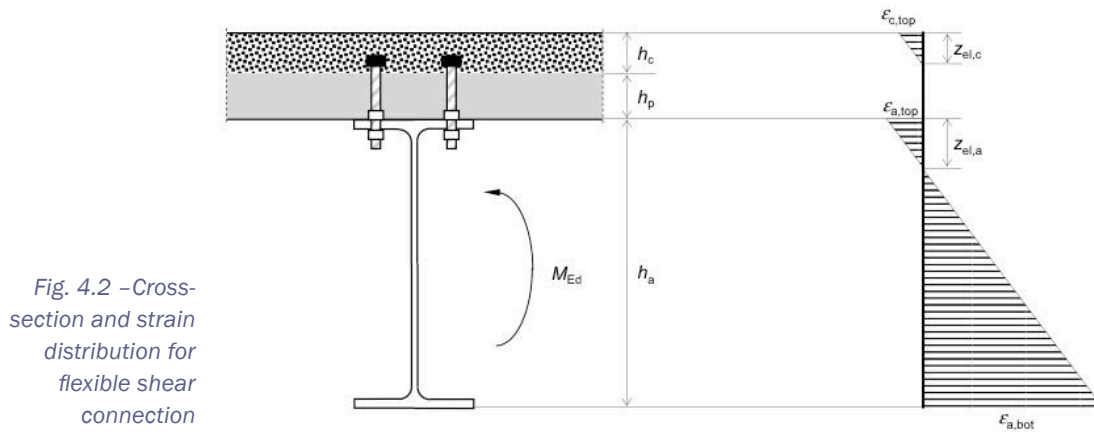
Cross-section and strain distribution for flexible shear connection
